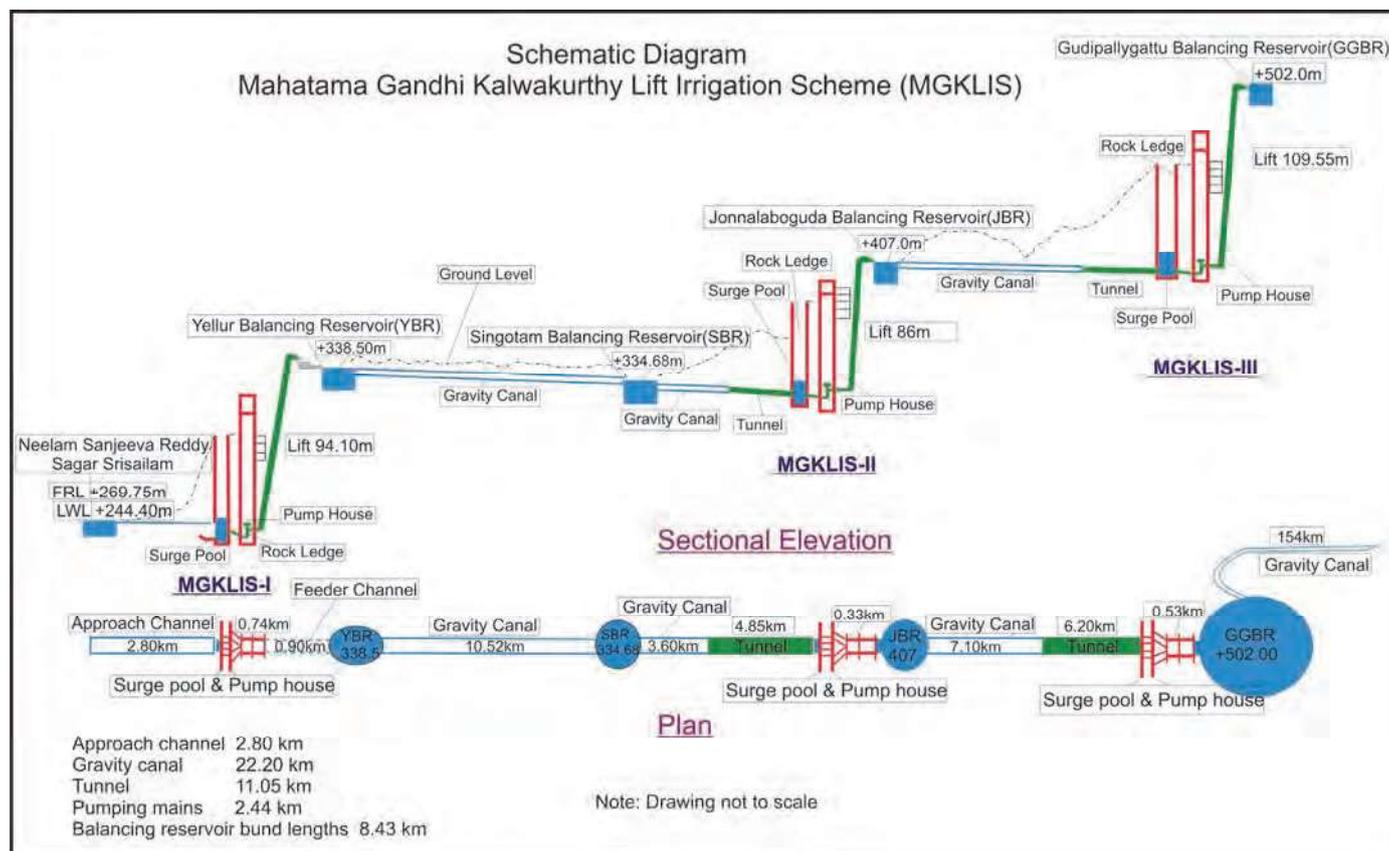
Plan and elevation of schematic drawing of MGKLIS [1]
